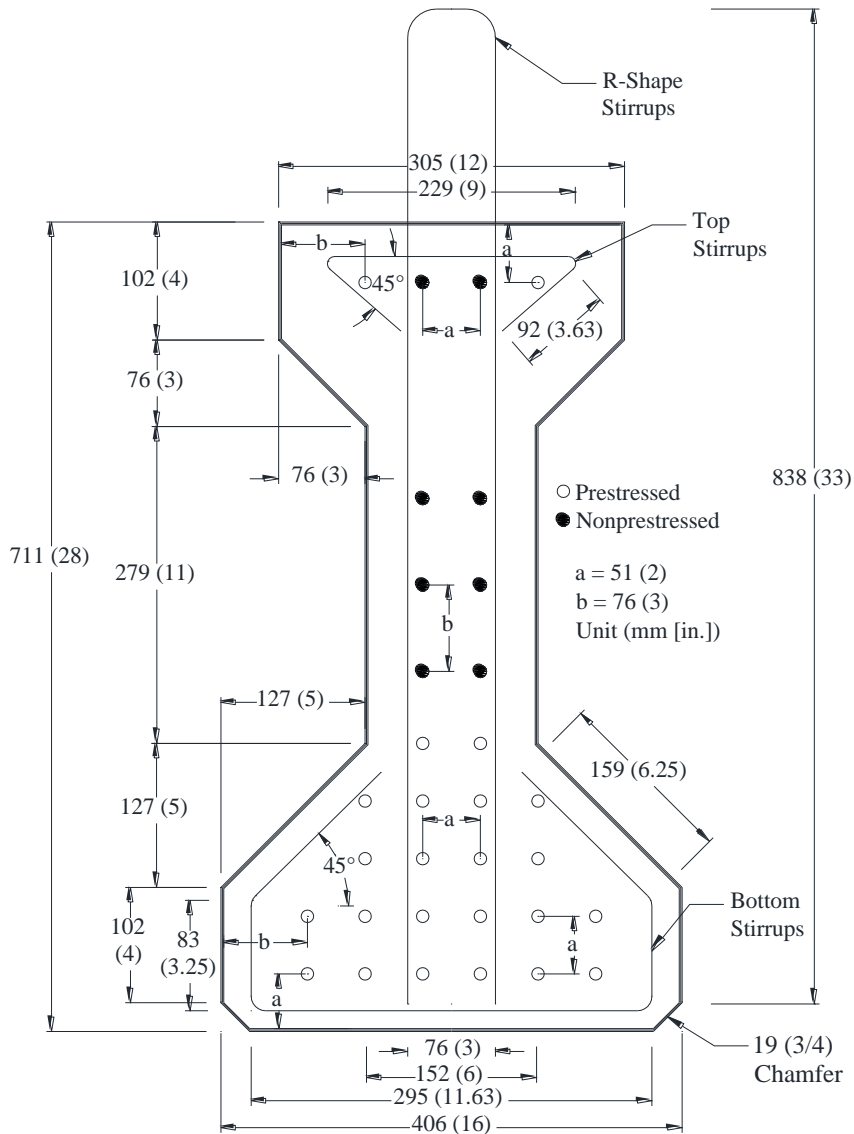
AASHTO I-Girder Type I with Composite Topping Deck Dimensions and Reinforcement.
